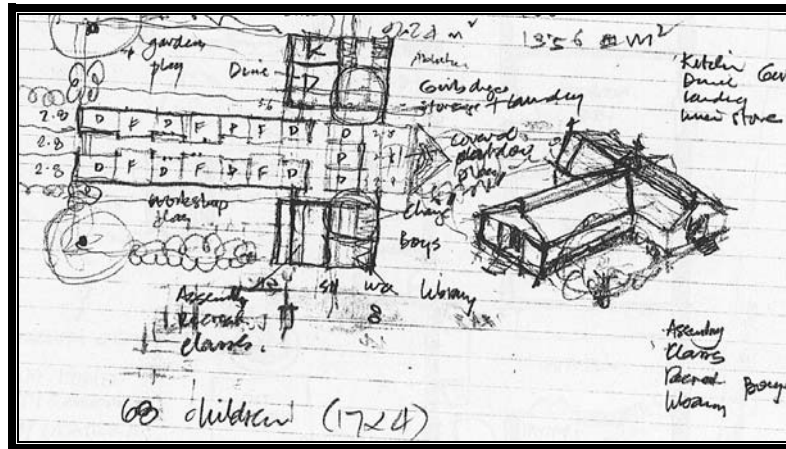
Conceptual Sketches of the proposed Jesu Ashram re-construction
